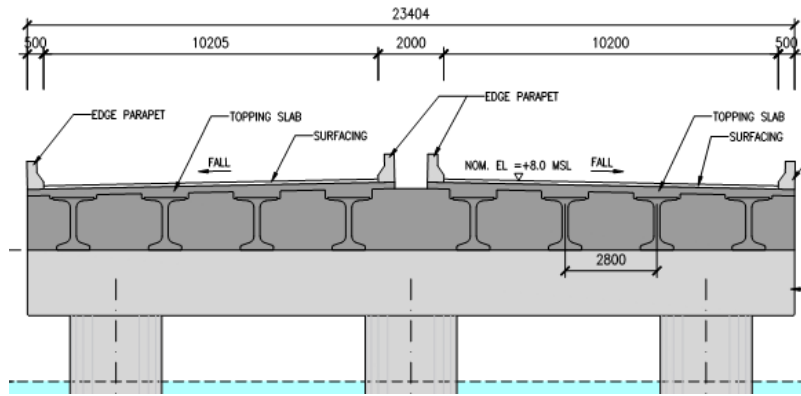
Typical Section of Embankment Viaduct with NU Girder
